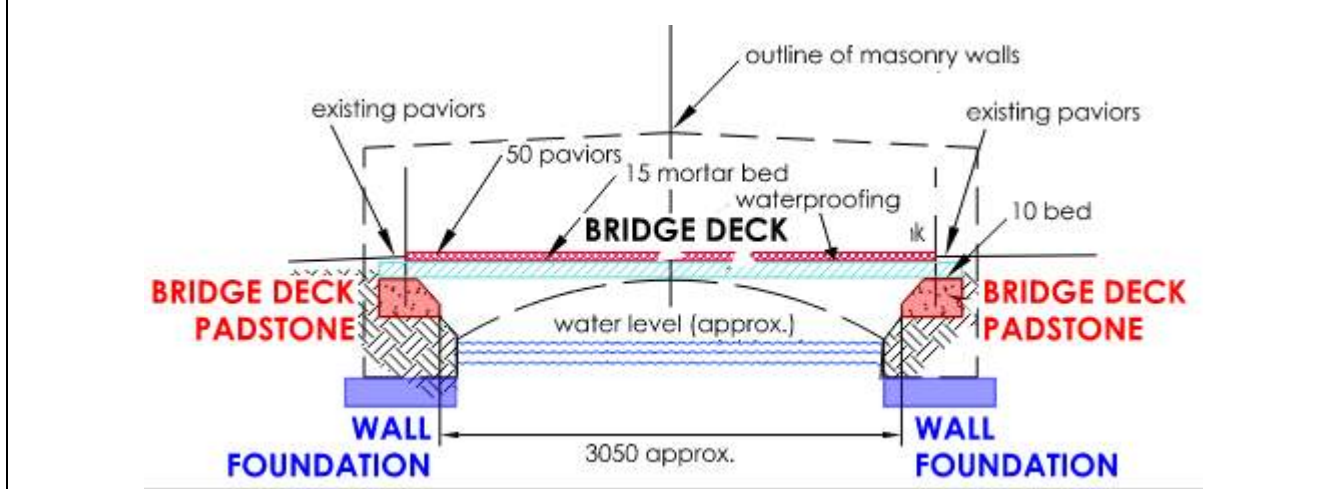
Section: Bridge Deck, Wall, Padstone and Foundation References
